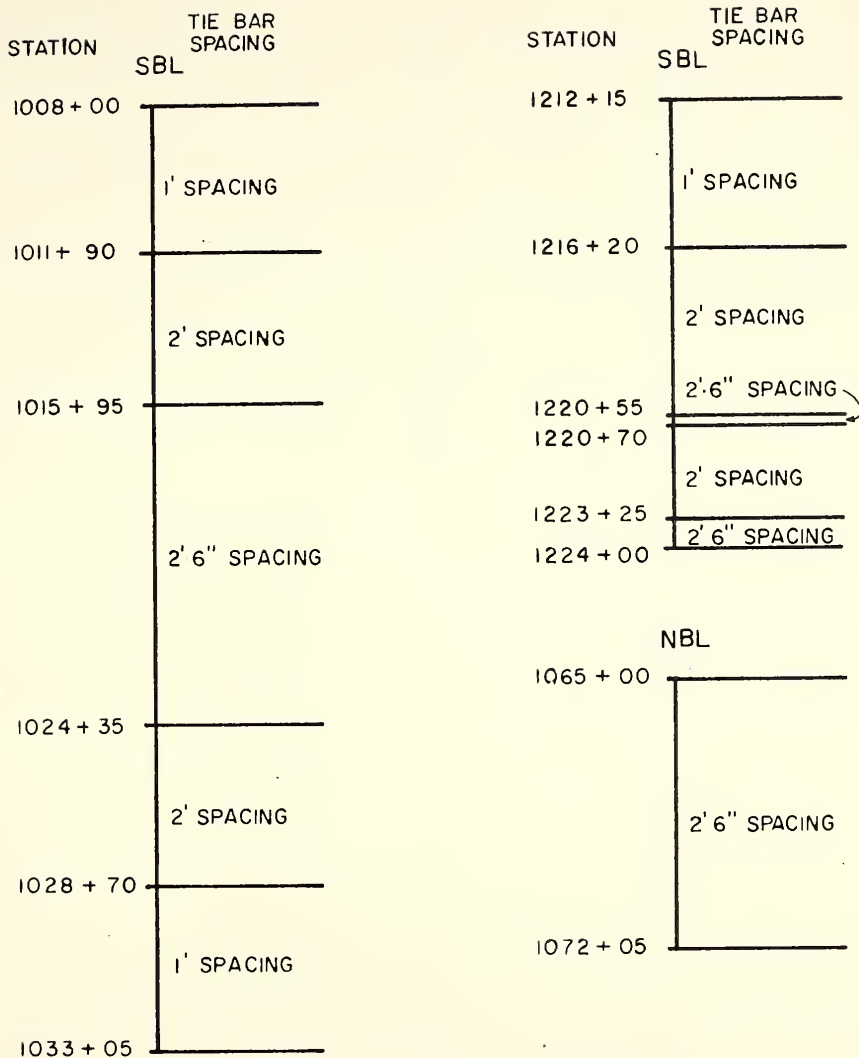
LAYOUT OF CONCRETE SHOULDERS
